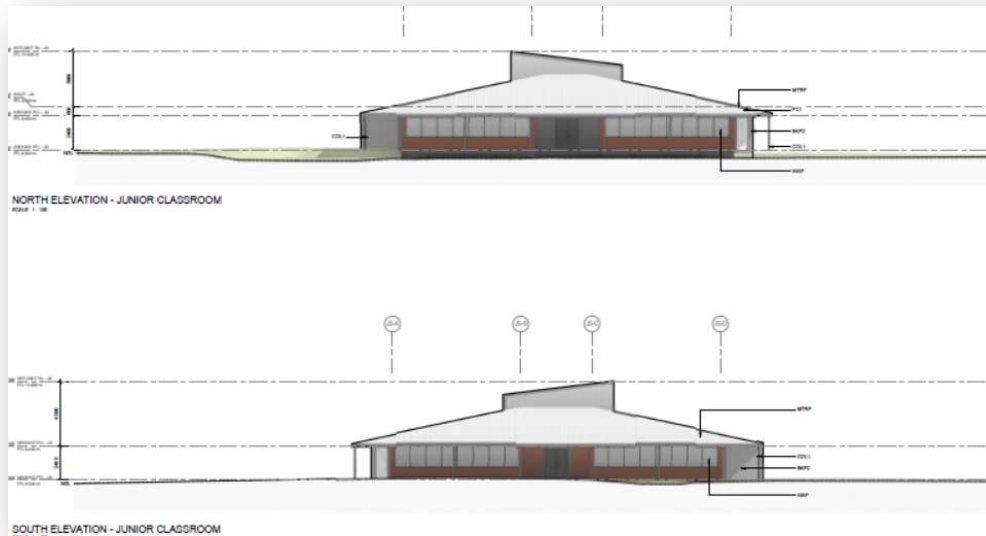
Elevations Plan (Drawing DA-JS-30-01) showing the north and south elevations of the Junior School Classroom (Source: Cox Architecture 2022)
